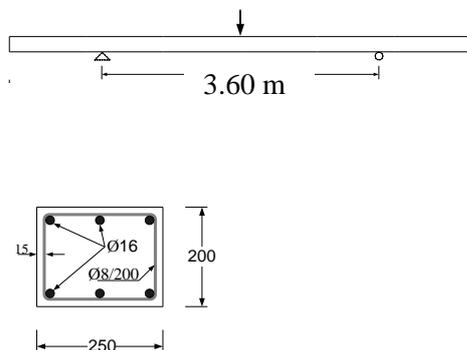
Static setup for the beam, cross-section, undamaged state #1.
